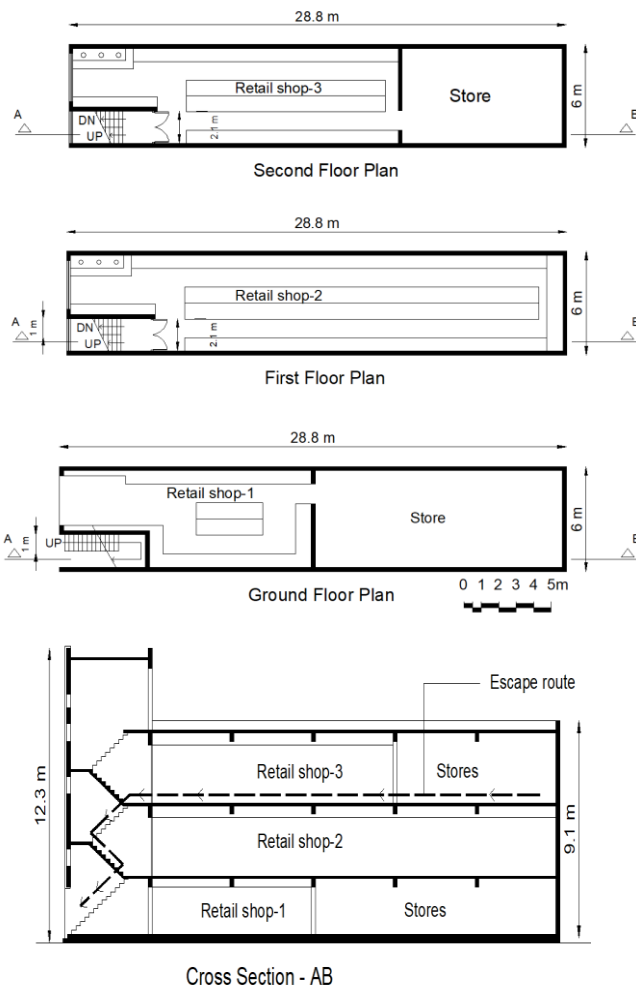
Floor plans and Section of T-C02-01 with escape route of 56m
